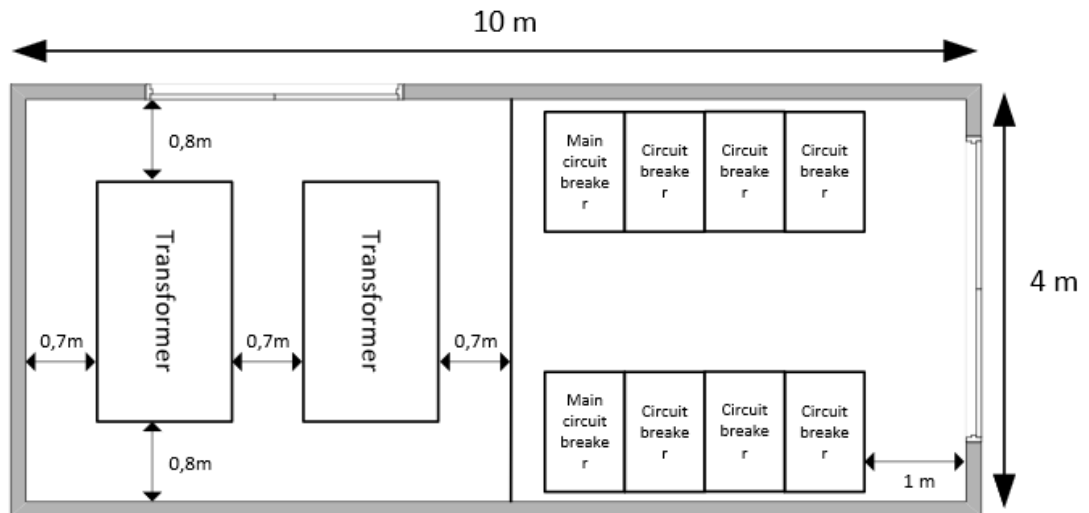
Required transformer substation layout - Patwardhan 2 depot
